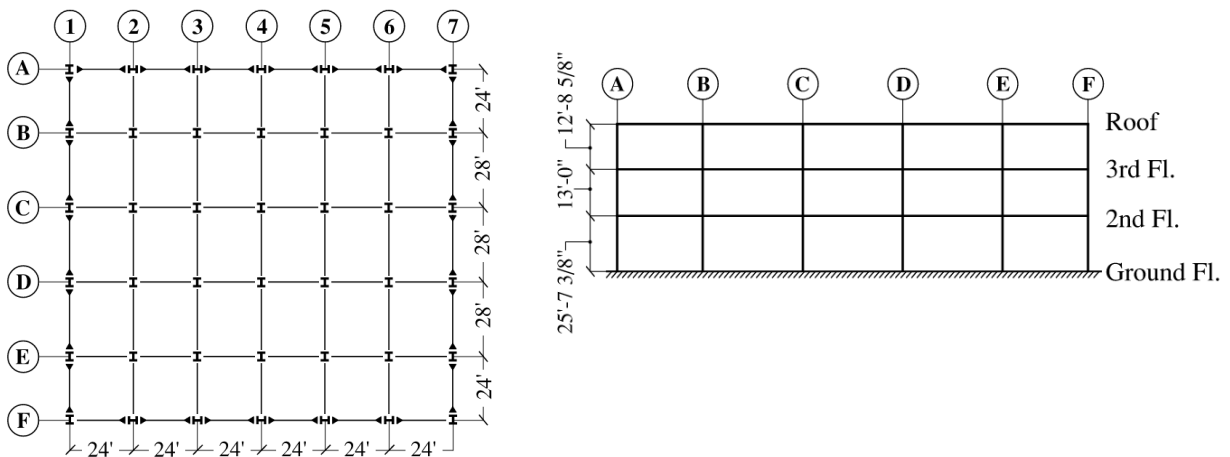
Plan view of building and elevation of perimeter frame on line 1
